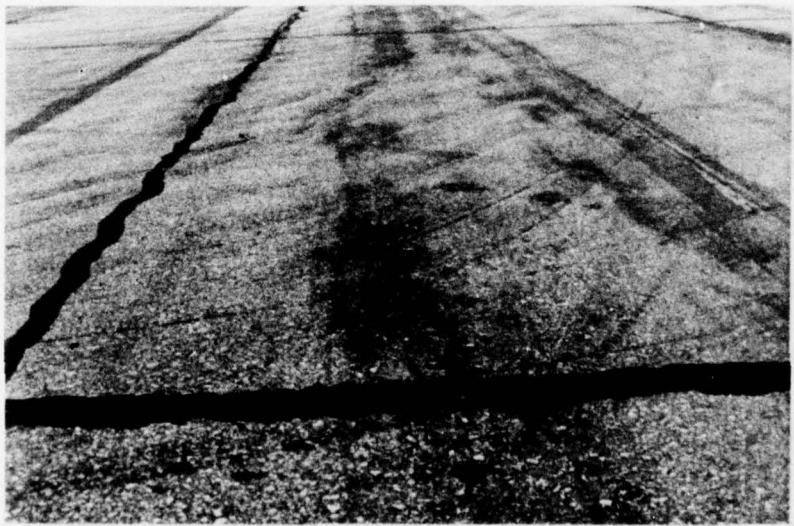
Low Severity Joint Reflection Cracking, Filled Crack.
